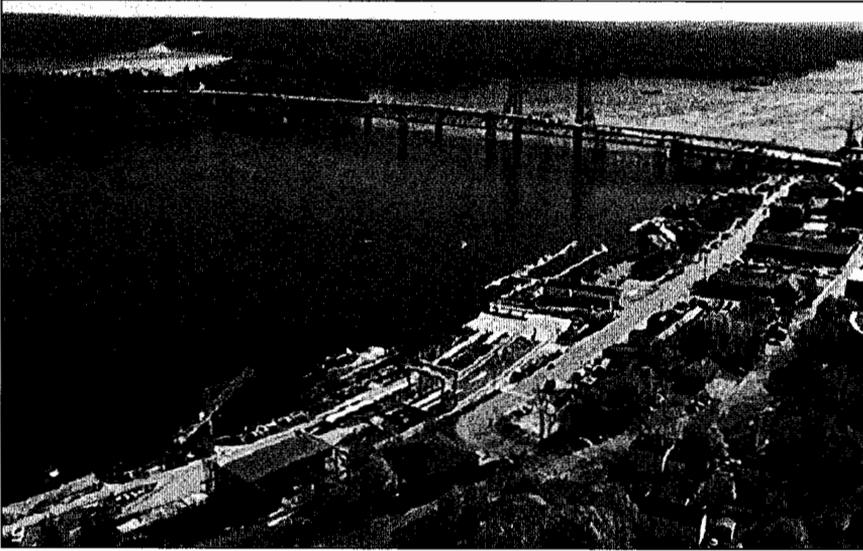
The overlapping footprint at the Bath abutment was handled by building the first span in two phases.
